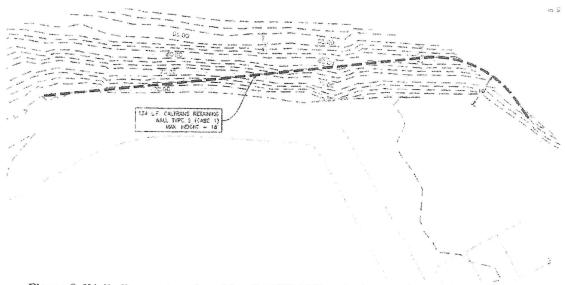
Wall alignment analyzed for CALTRANS typical tapered retaining wall design.
